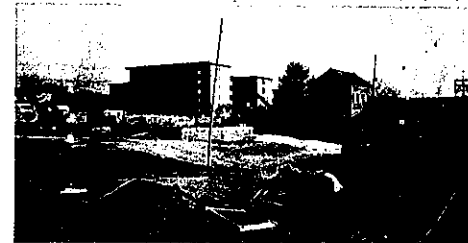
the "Blind Development" Made the Old Urban Shelters Redevelopment Has Turned Out to Be a Simple Construction Project.
